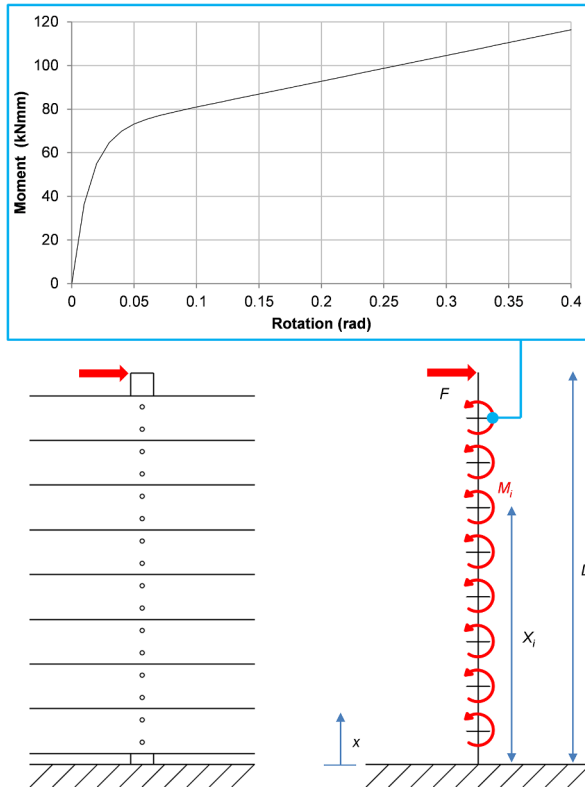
Scheme for the analytical calculation of the floor deflection in the direction orthogonal to the joists: for the moments given by nail couples, the shown average backbone curve calibrated from the conducted experimental tests on plank-joist connections was used.
